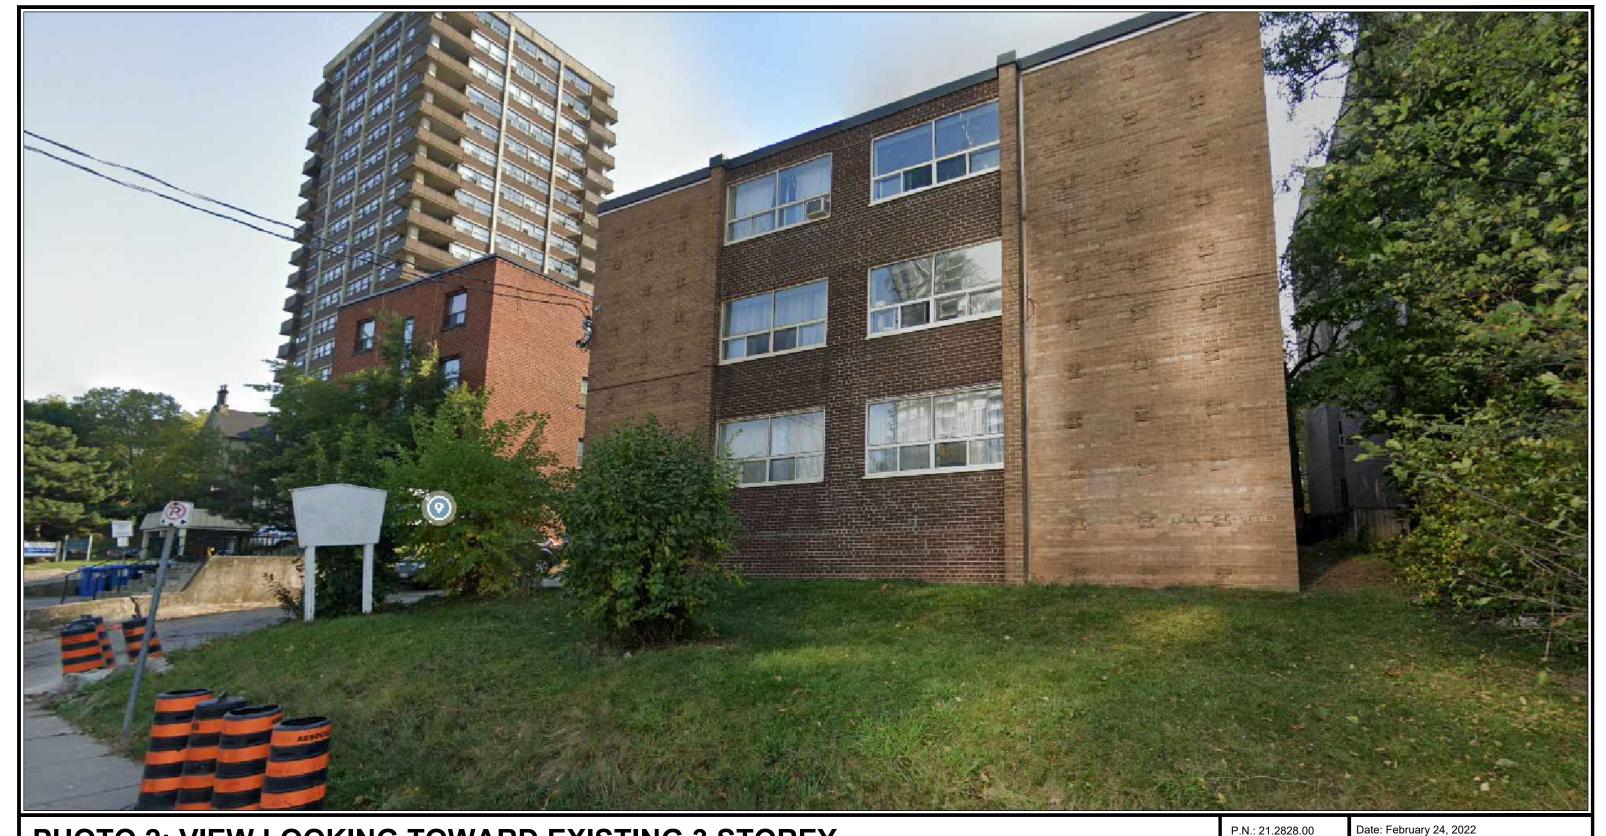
VIEW LOOKING TOWARD EXISTING 3 STOREY RESIDENTIAL APARTMENT BUILDING from ST. JOSEPH'S DRIVE
